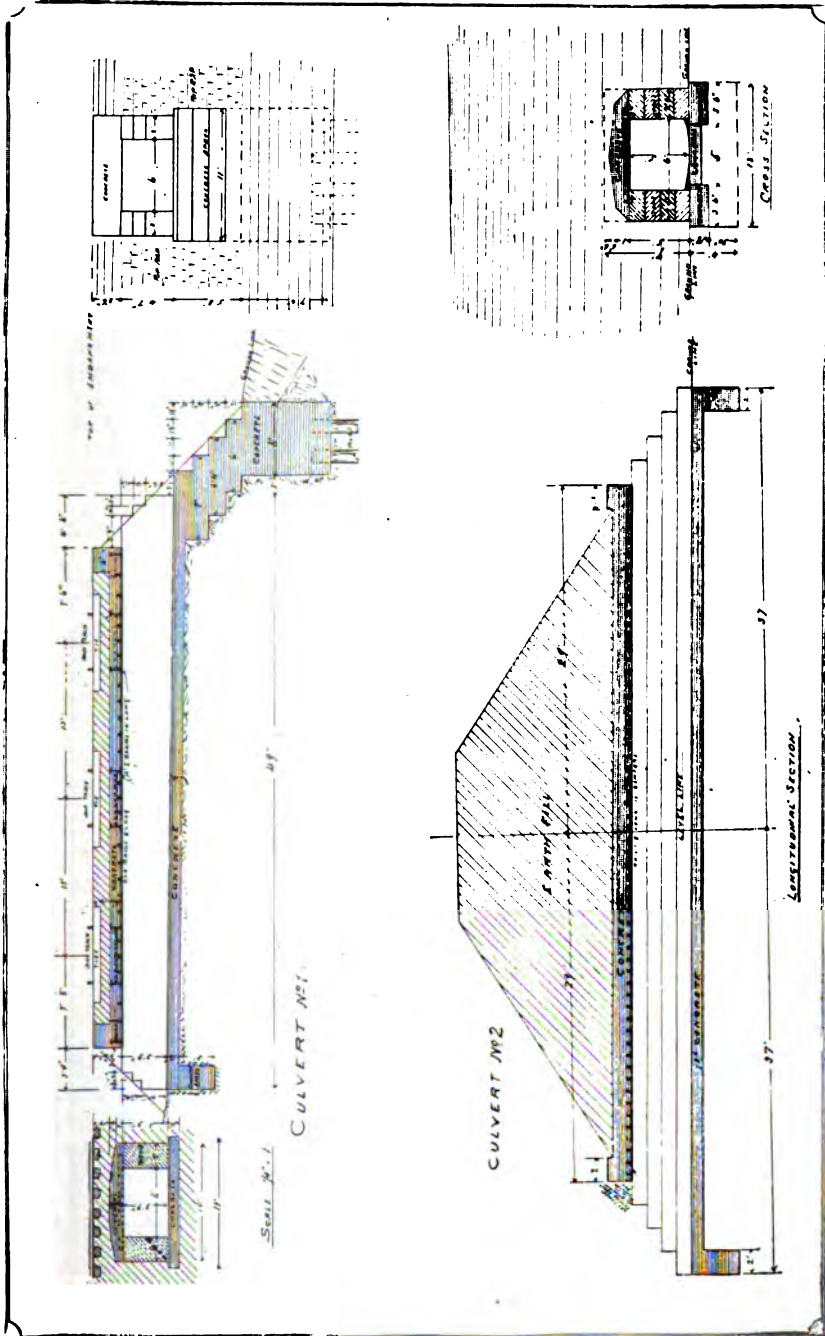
BALLAST FLOOR CULVERT BRIDGE.
